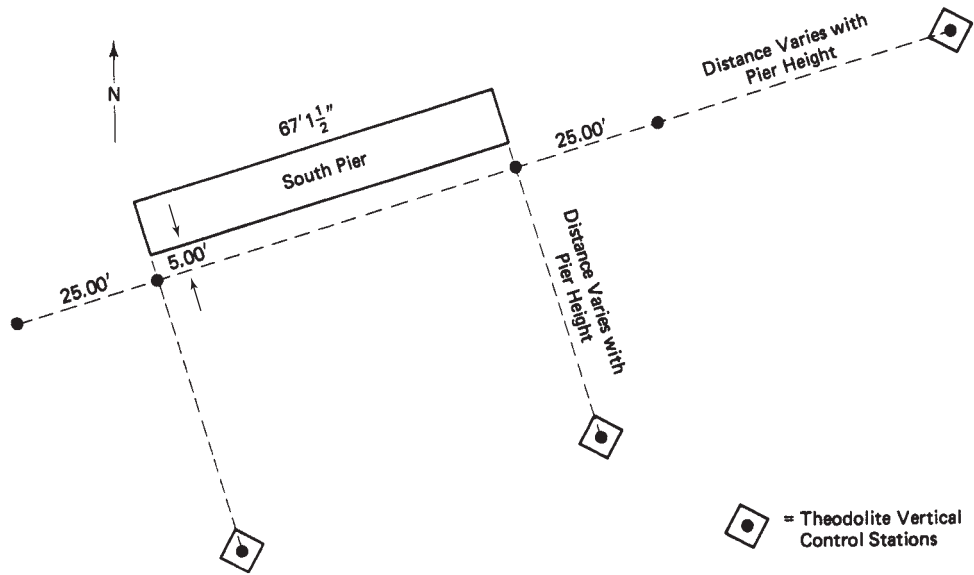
Theodolite stations that can be used for plumb checks as the construction rises above the ground. See also Figure 16.8.
